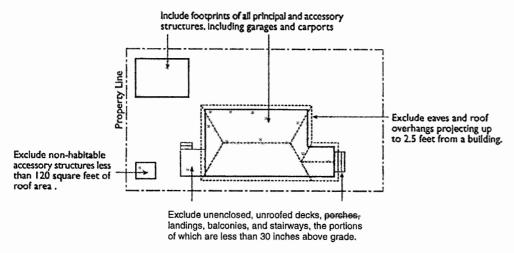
J: DETERMINING LOT-BUILDING COVERAGE
